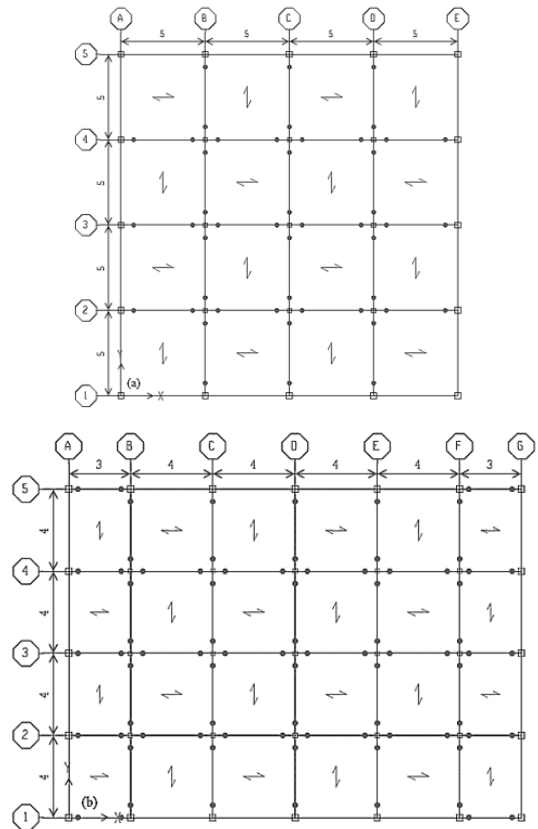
(a) four-story building Plane (b) five and seven-story building Plane
